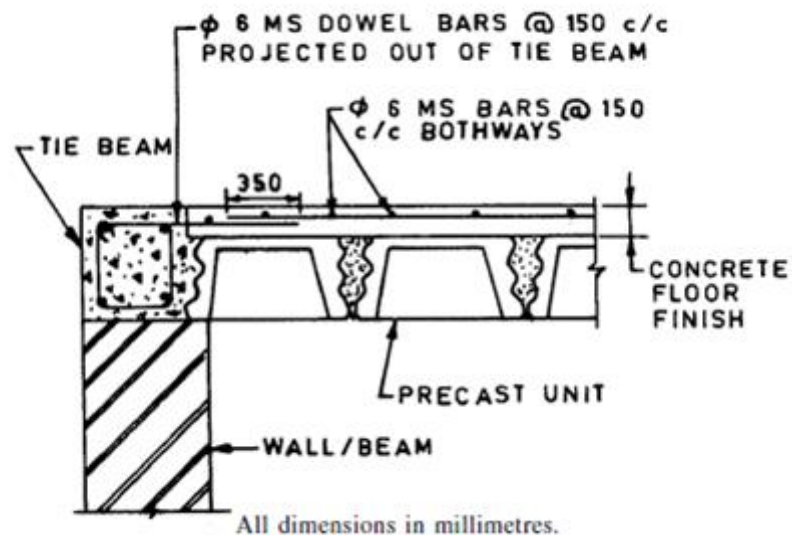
PROVISION OF REINFORCEMENT IN CONCRETE FLOOR FINISH
